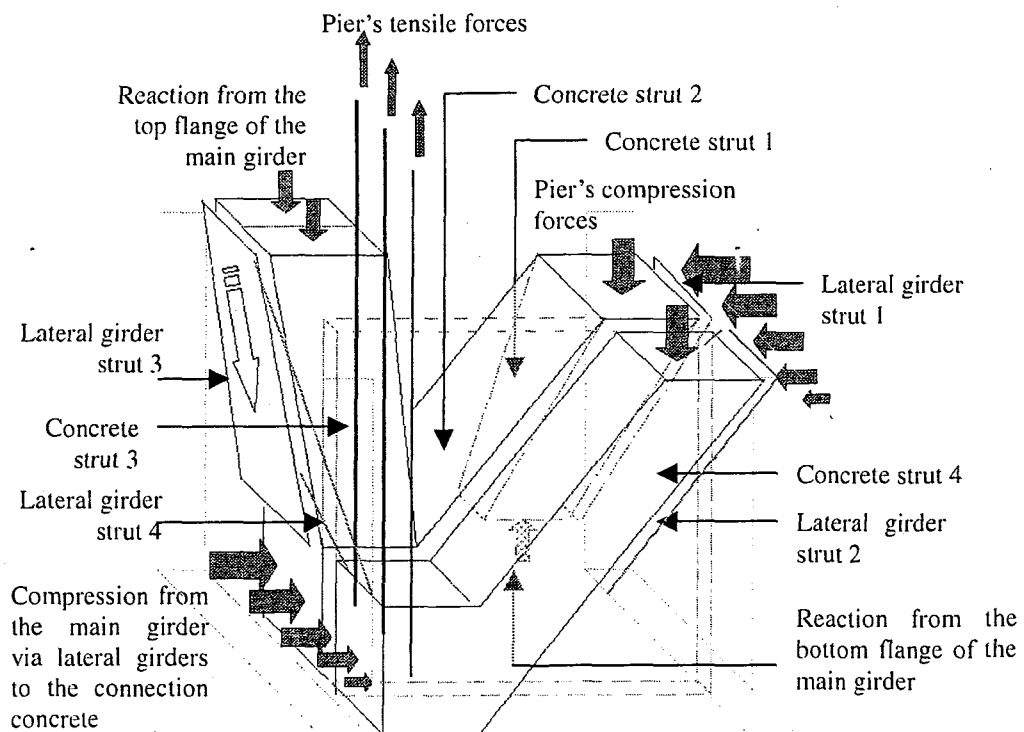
Force transfer mechanisms inside connection concrete of specimen C-3.
